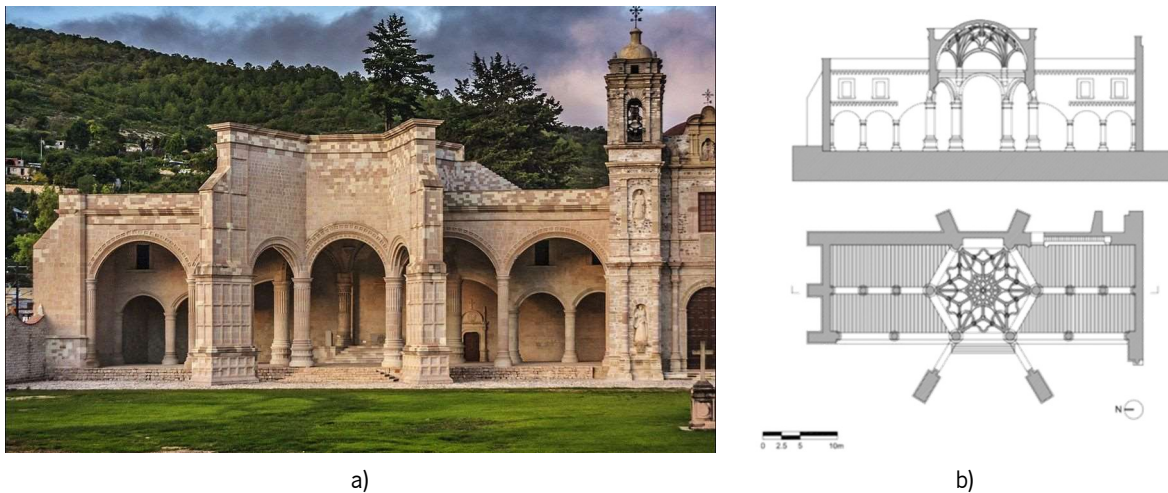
Open chapel from *San Pedro* convent in Teposcolula, Oaxaca (HA 2018): a) west façade; and b) roof plan and elevation.
